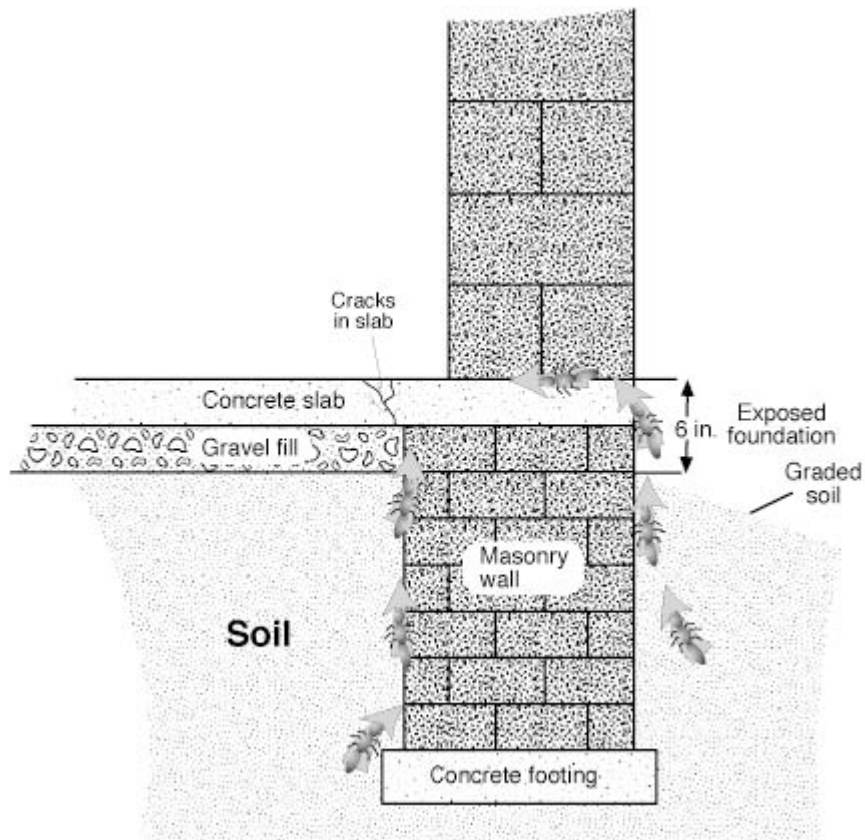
A structure with a supported slab foundation with arrows indicating potential termite entry points (illustration courtesy of the Ohio State University, Extension Entomology)
